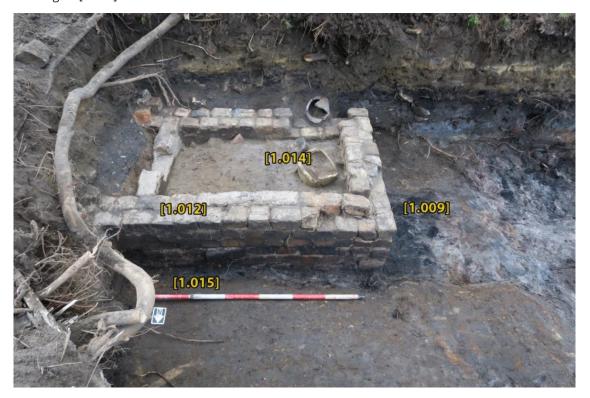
Toilet outbuilding [1.012] in the rear yard with sewer line and closet bend intact [1.014], looking south. A construction cut [1.016] and fill [1.015] for the foundations was identified on the northern side, cut into the levelling fill [1.008]. The internal rooms of the toilet were both lined.
